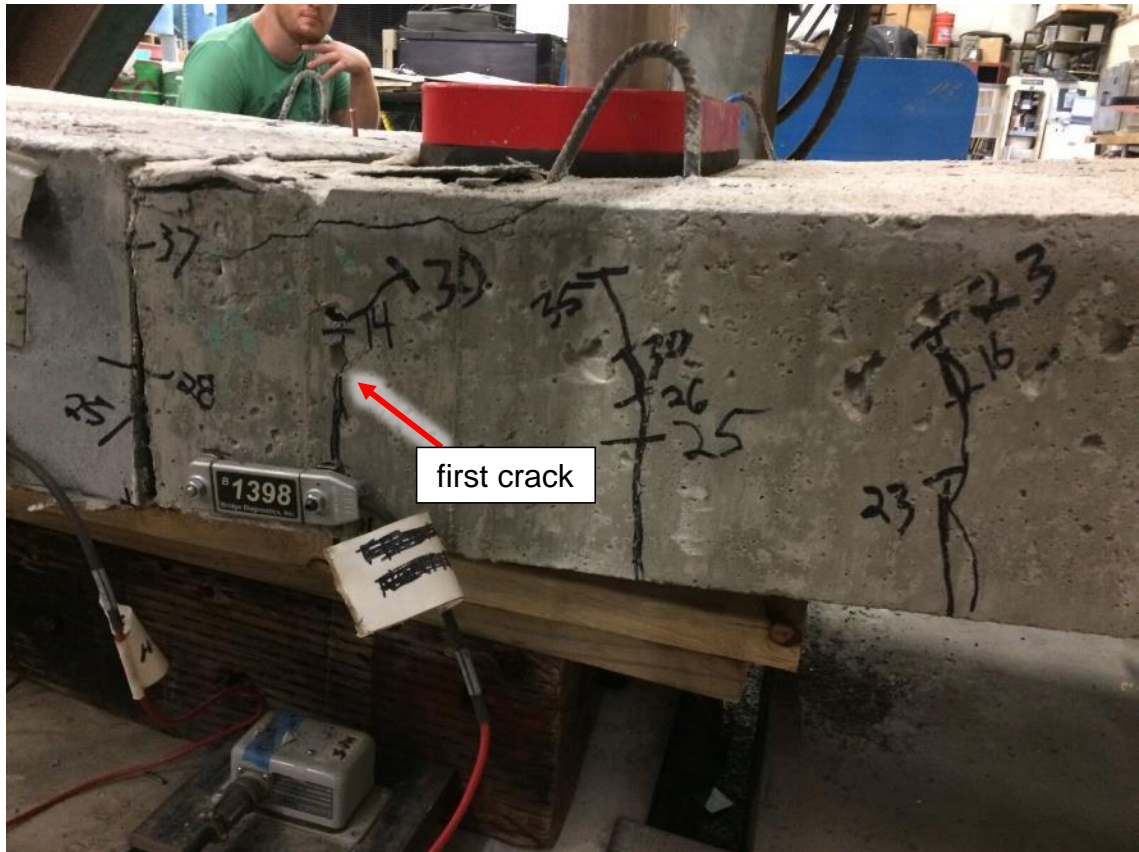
Cracking underneath load on south side of slab 2 and crushing of concrete near load point
